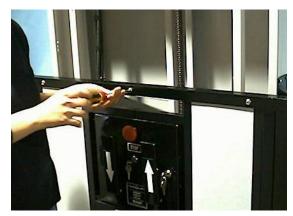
B- FASTENING CONTROL WALL EXTENSION TO GUIDE FRAME
